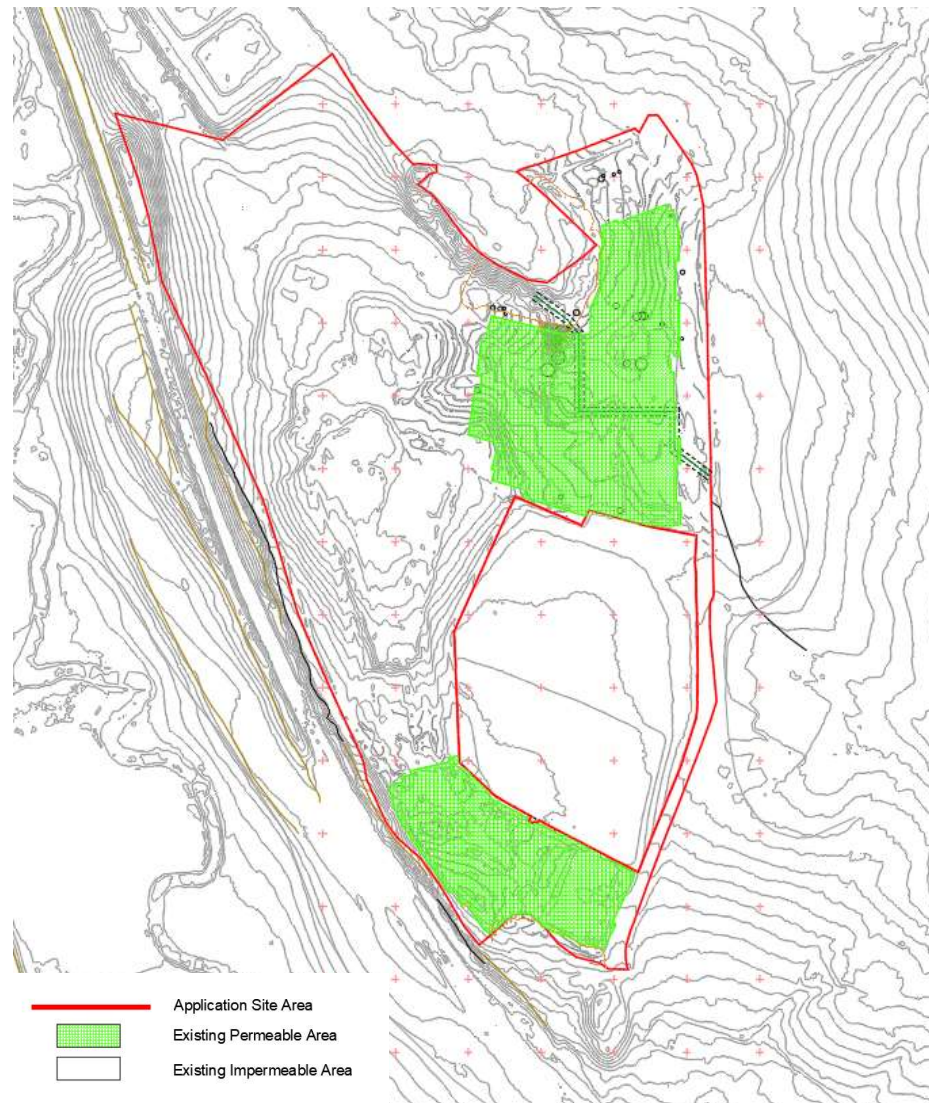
Total application Site Area showing existing permeable/ impermeable areas.
